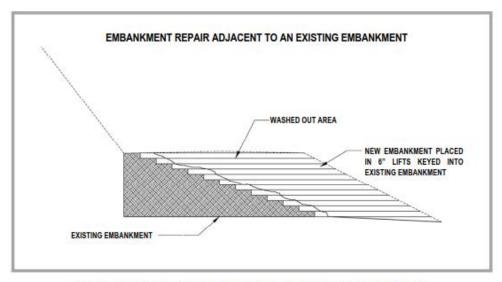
Roadway Embankment Repair Adjacent to an Existing Embankment (Typical)
